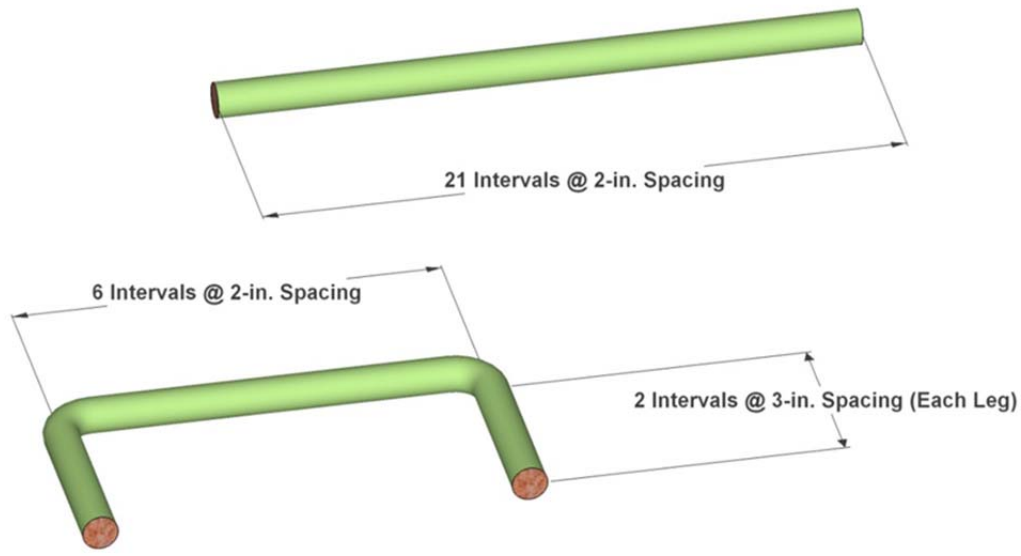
Interval Layout for Longitudinal Bars and Stirrups
